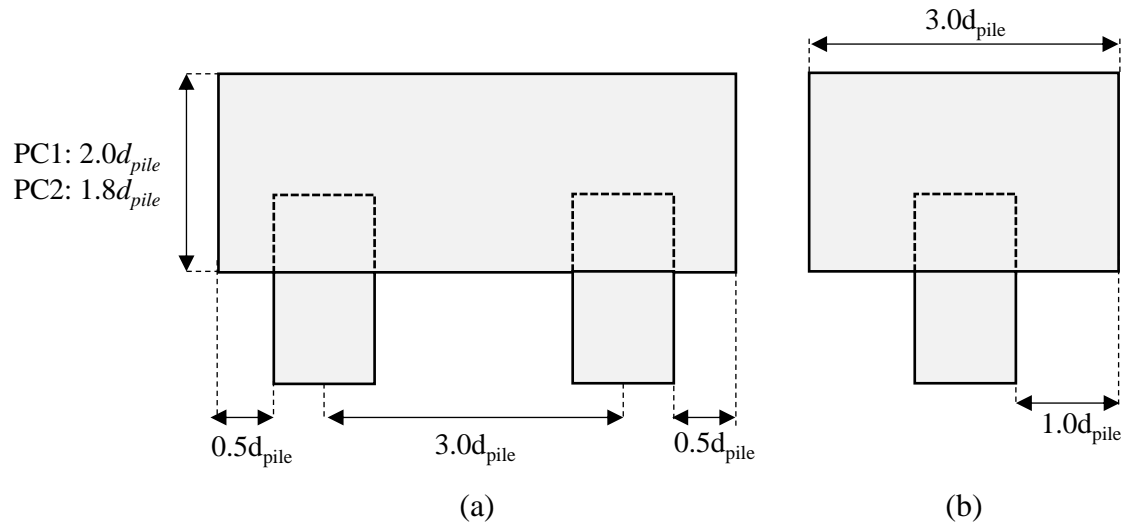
General pile cap dimension details (a) plan and (b) elevation views
